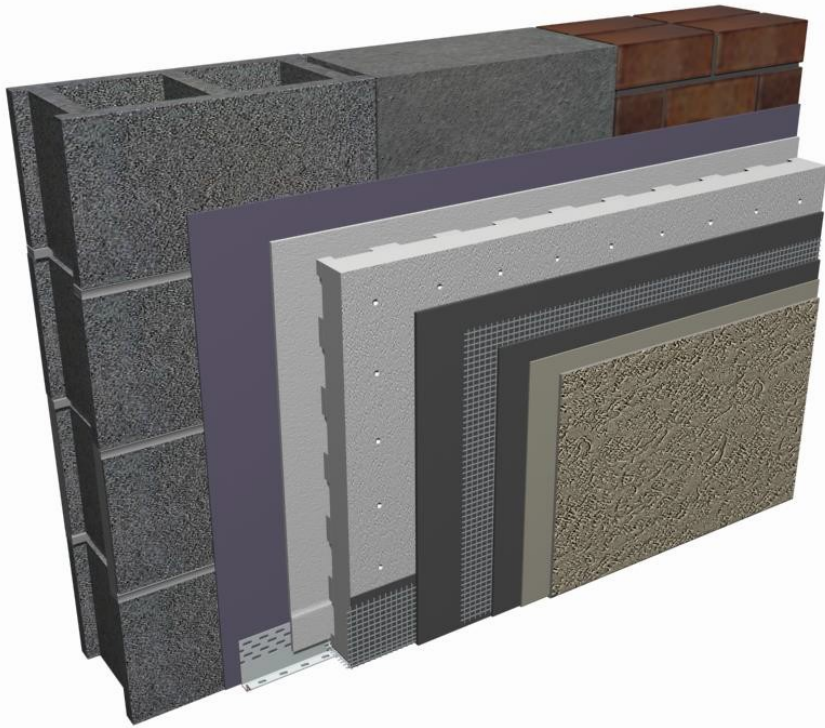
"PUCCS EIFS" with "Roller Bear" and "Cement Bear" over masonry, concrete, and brick
